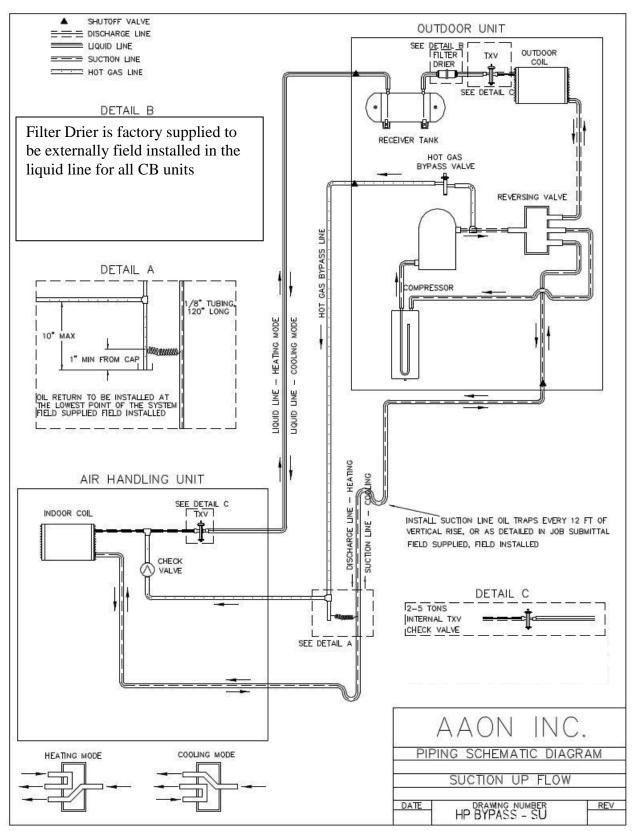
Heat Pump with Hot Gas Bypass Split System Piping, Suction Up
